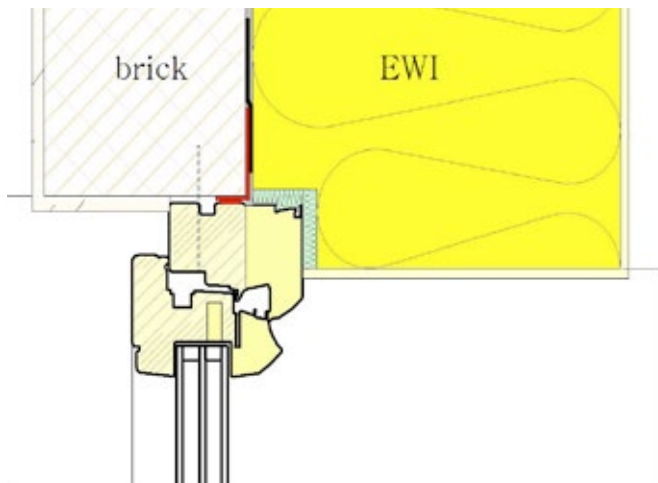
Window detail at Grove Cottage, Hereford. Image courtesy of Simmonds Mills Architects
